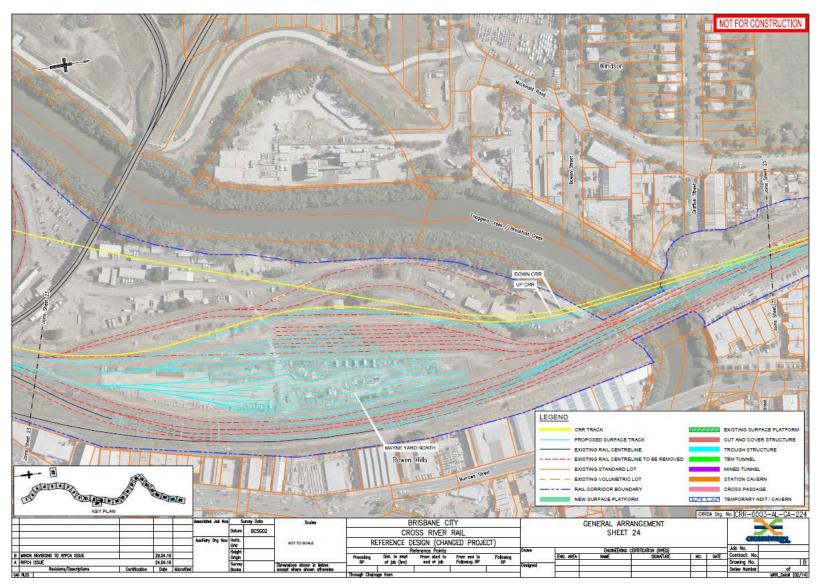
Project work at Mayne Railway Yard north within the existing rail corridor and Breakfast Creek
